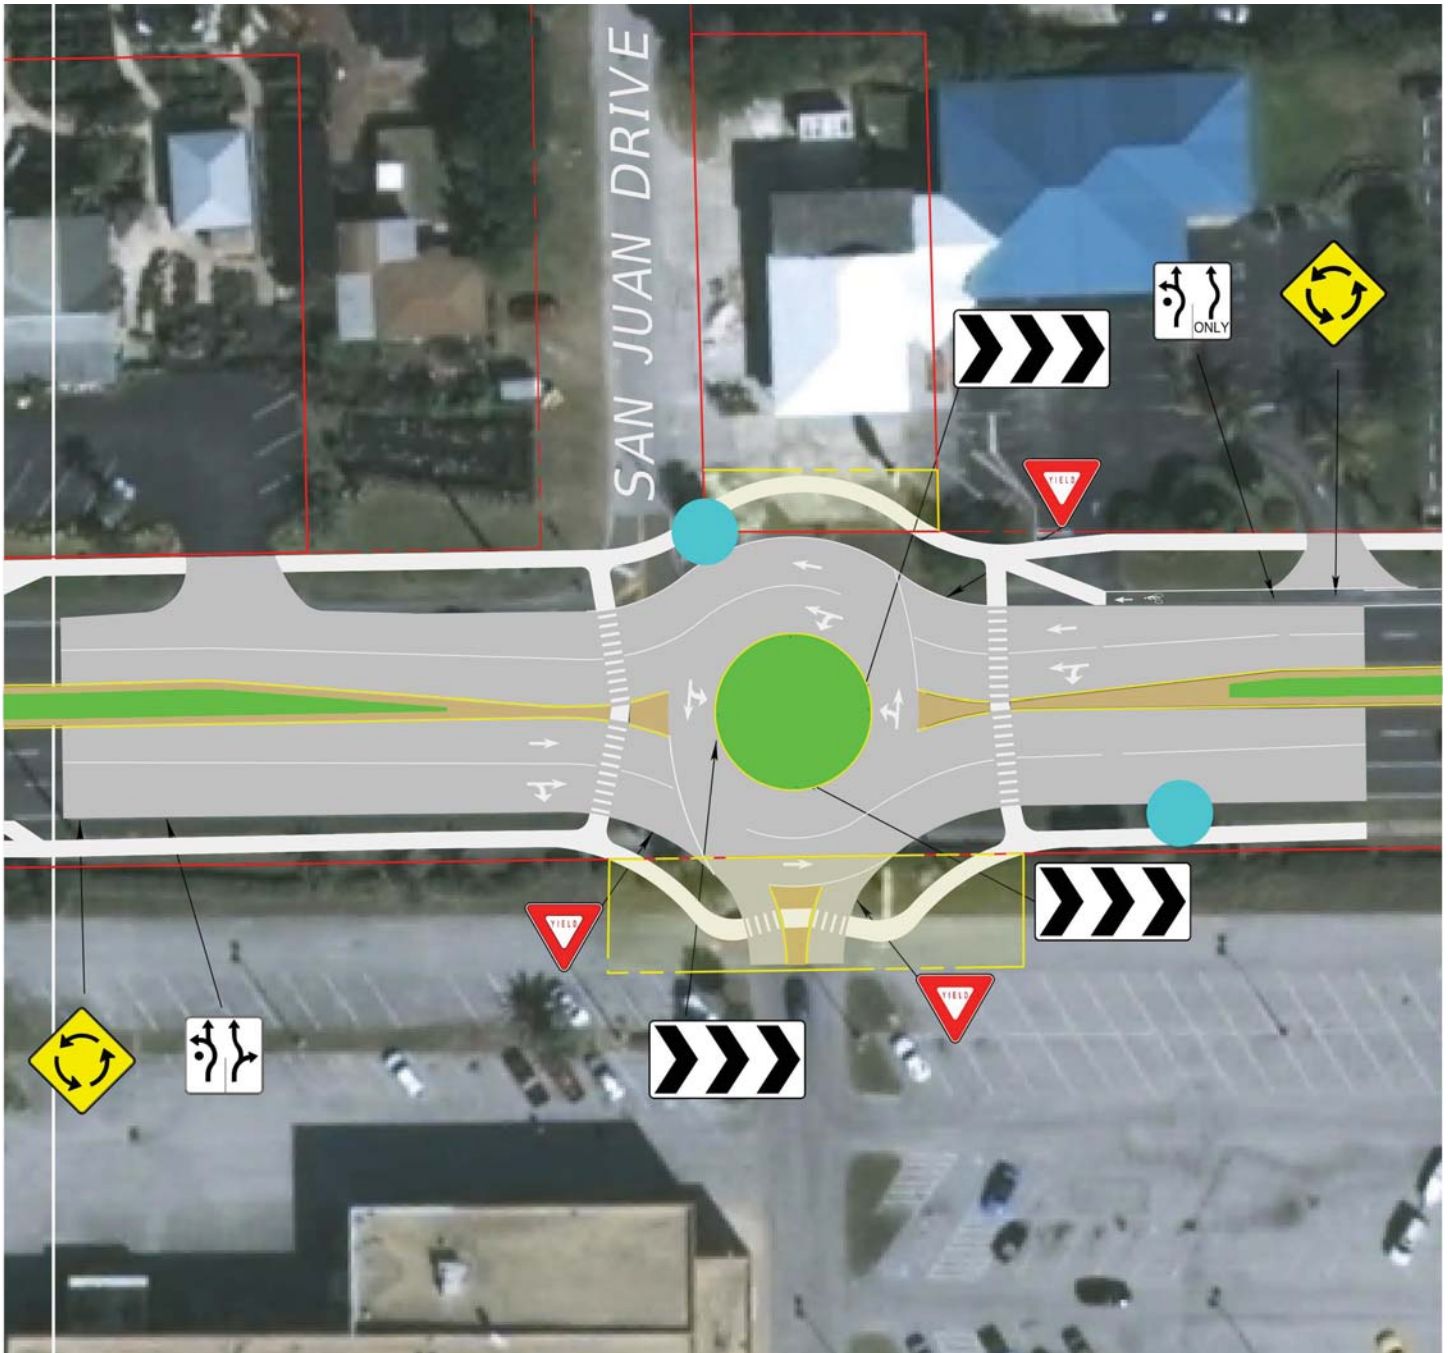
Plan View of Group 2 Improvements – Roundabout at Burns Boulevard
